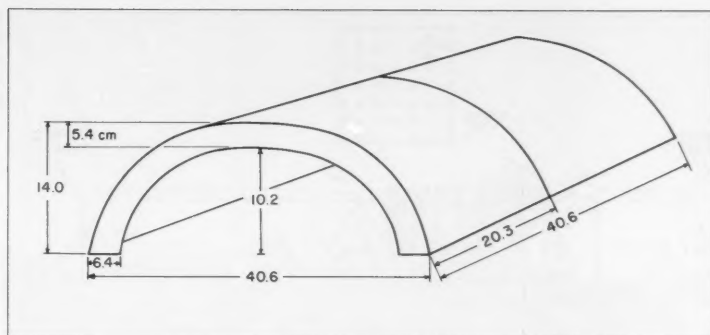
Smaller single-chamber unit fabricated from pumice concrete (dimensions in centimeters).
